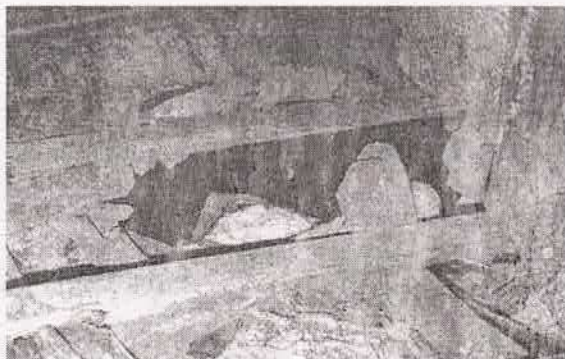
Steel crossbar and goal-post support in an Endless Haulage roadway in Digwadih Colliery (courtesy TISCO, Jamadoba, Basu, 1999).
